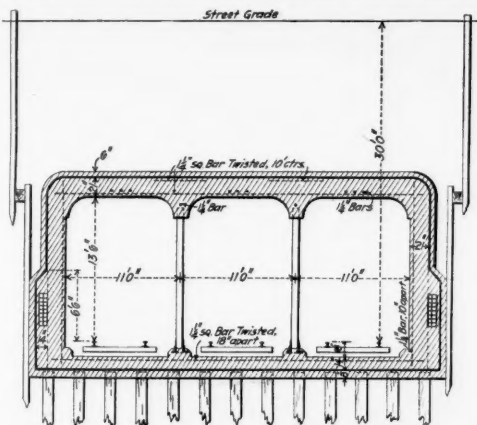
Section of Tunnel with Concrete-Steel Construction.
